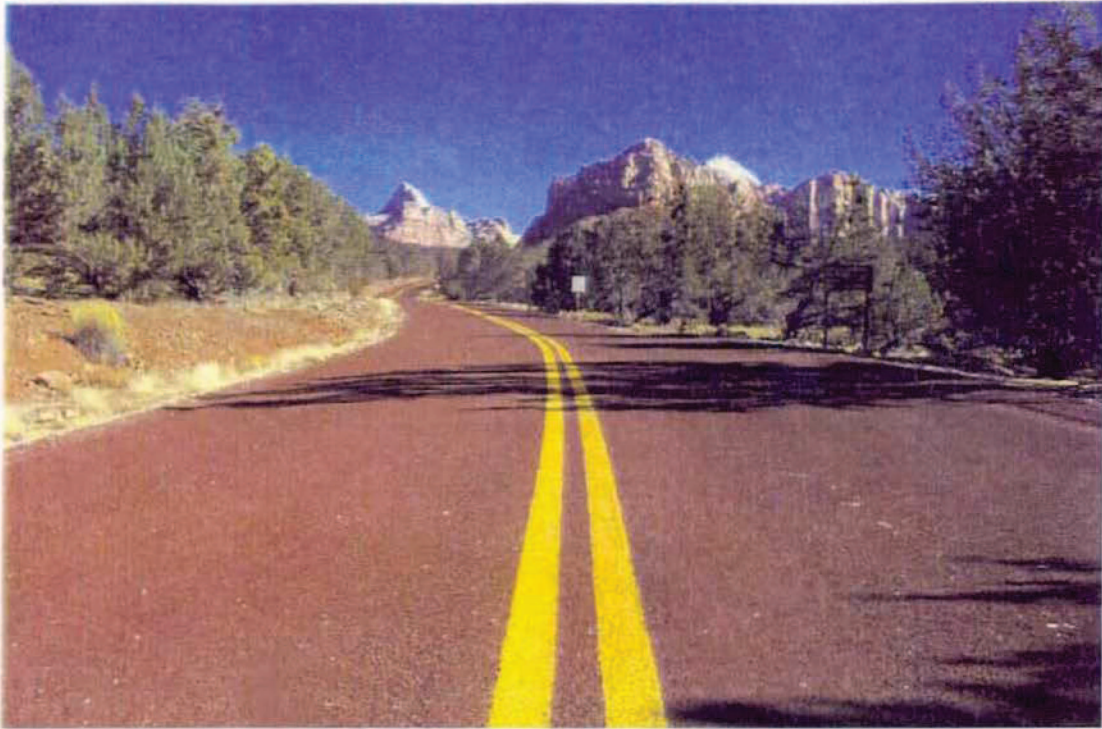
MP 0.00 - Begin South Section, Typical Pavement Section
